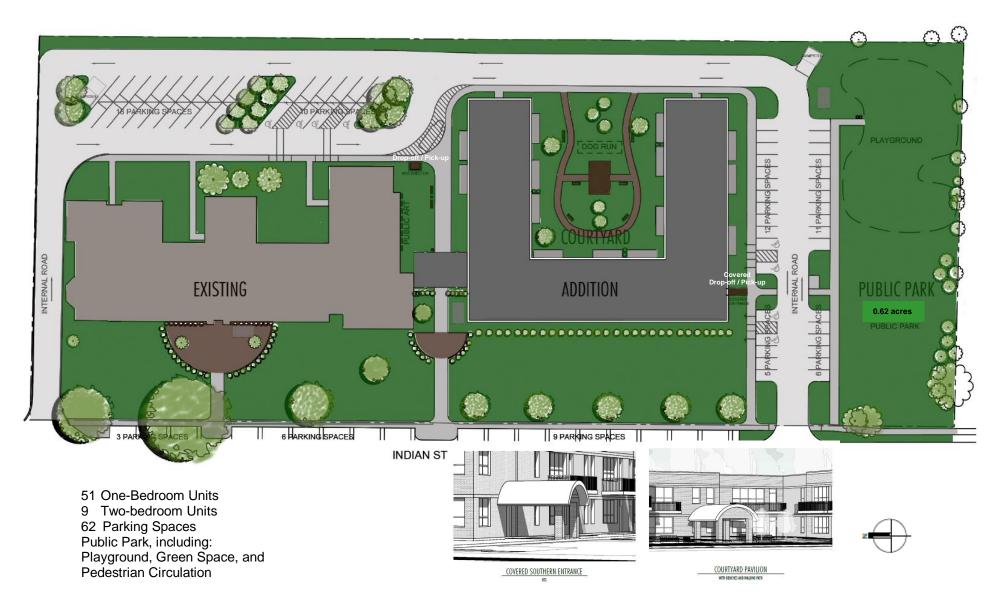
John Grace Arms Senior Housing – Landscape Plan
